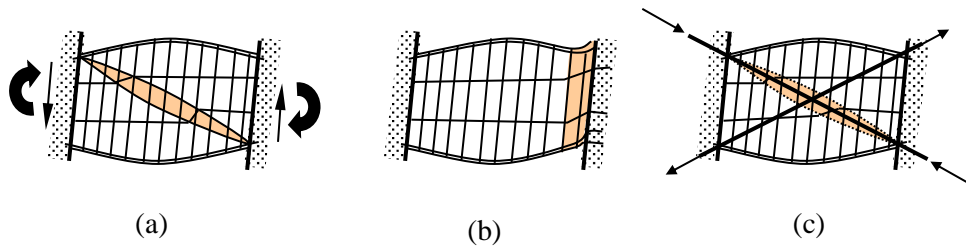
Mechanism of shear resistance in coupling beam: (a) diagonal tension failure, (b) sudden sliding shear failure at beam-wall junction, and (c) diagonal reinforcement in coupling beam (Paulay and Priestly, 1992).
